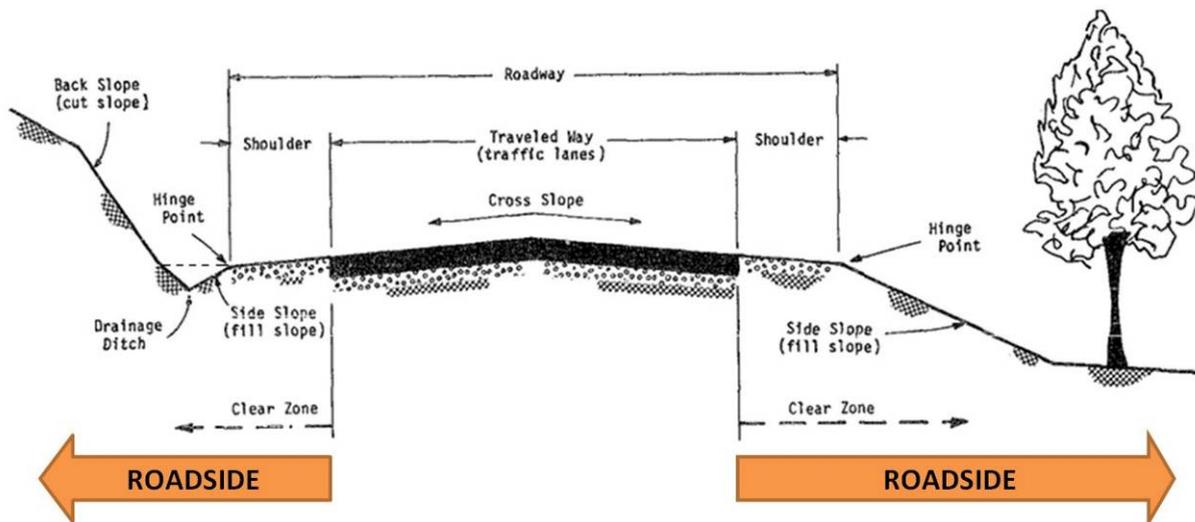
Roadway cross section with examples for road sides with clear zones [2].
